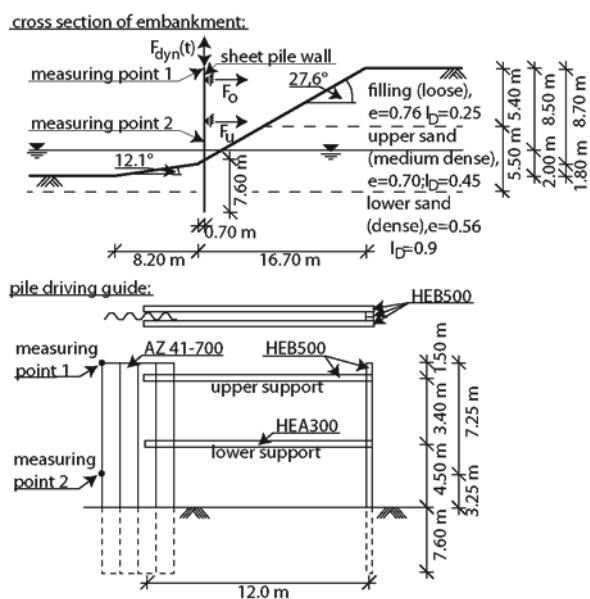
Top: cross section of the embankment; bottom: engaged pile driving guide.
